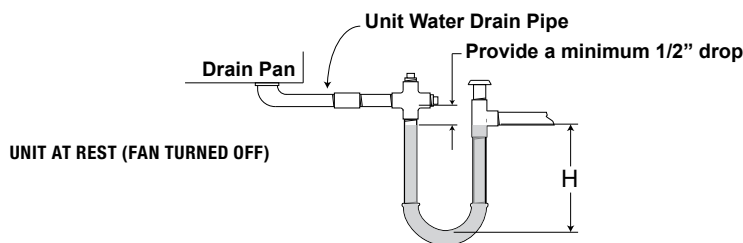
TYPICAL DRAIN TRAP CONSTRUCTION
